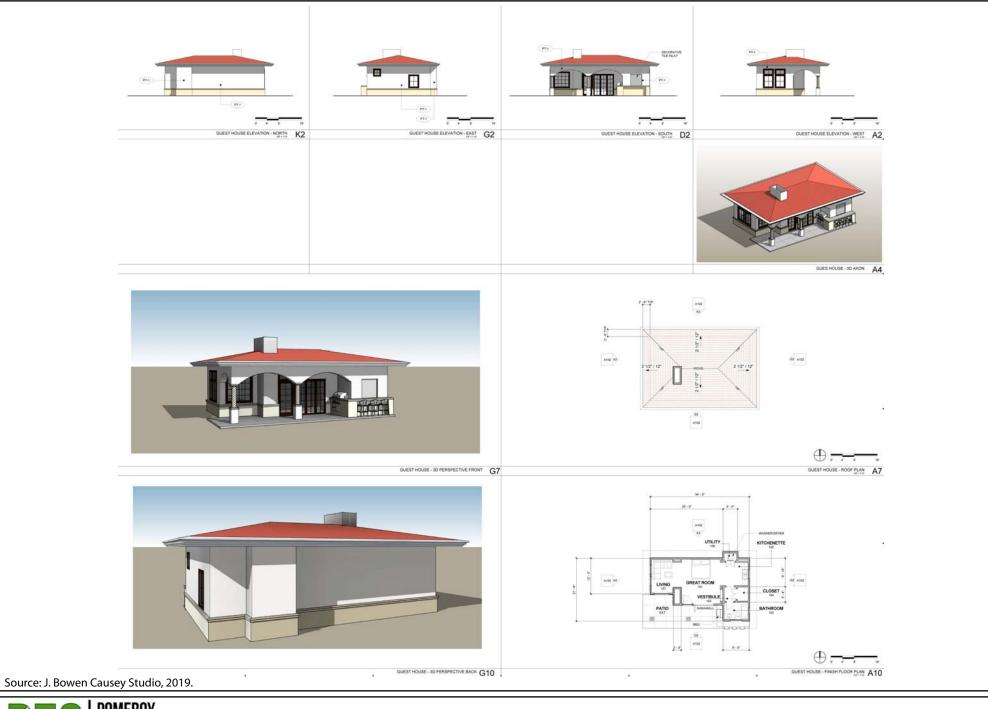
Option D(2) - Floor Plans and Roof Plan
